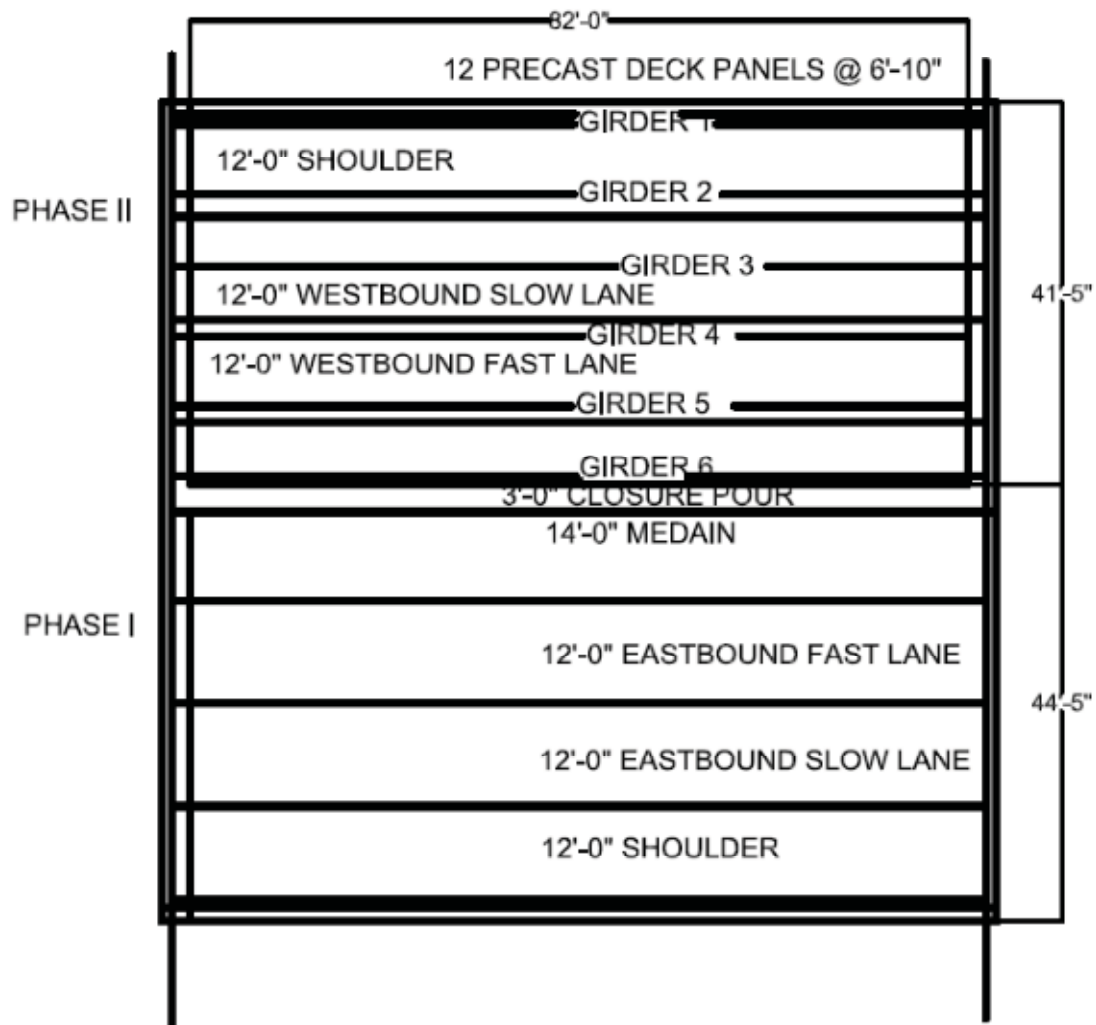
Plan view of Beaver Creek Bridge showing prestressed girders and traffic lanes
